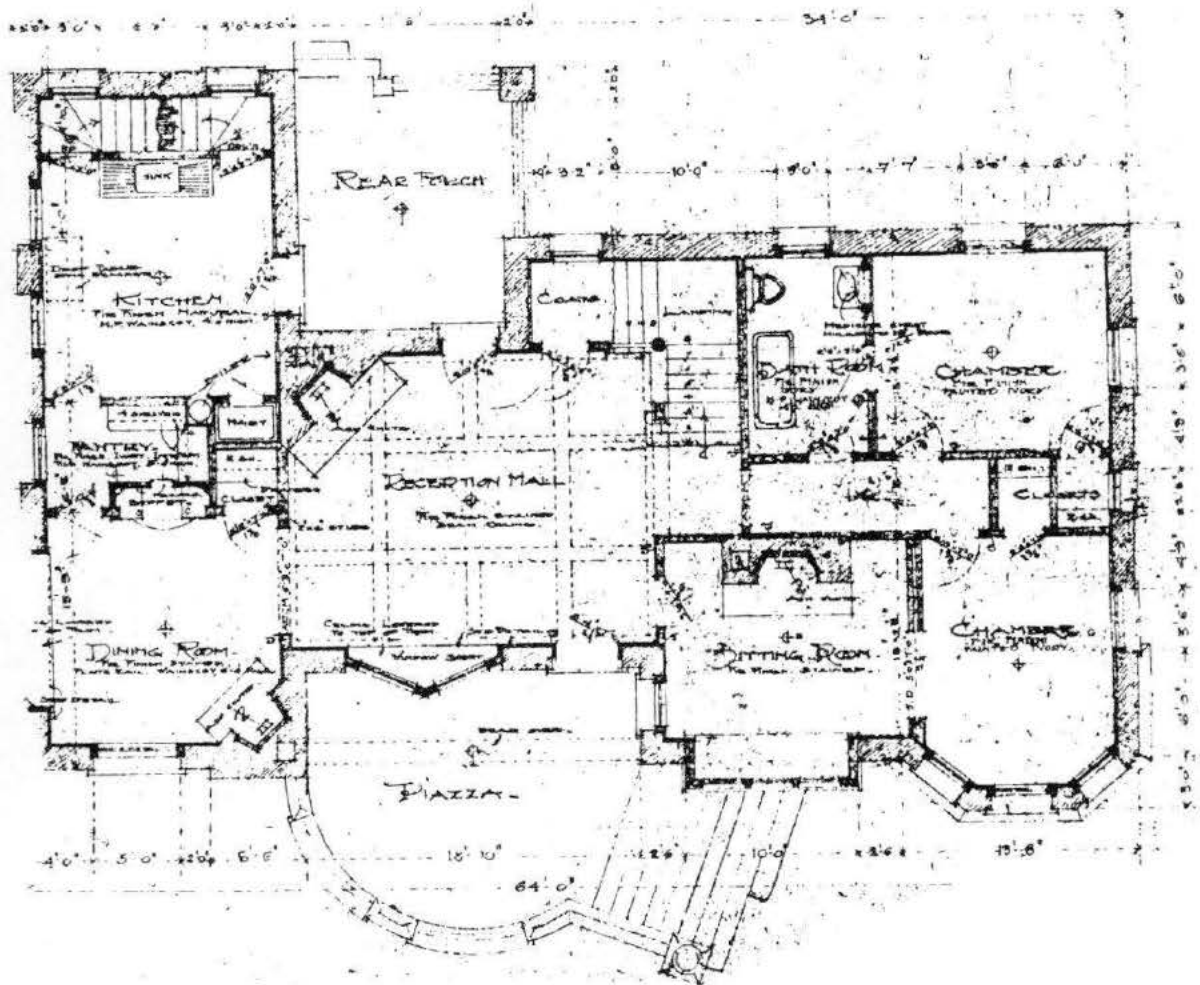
Emil Schacht, McClure residence, White Salmon, Washington, date unknown, first floor plan (Cachot Therkelsen Collection, Knight Library, Special Collection, University of Oregon).
